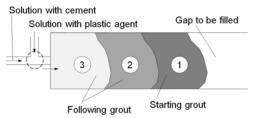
Schematic diagram of hydraulic plastic grout during injection
